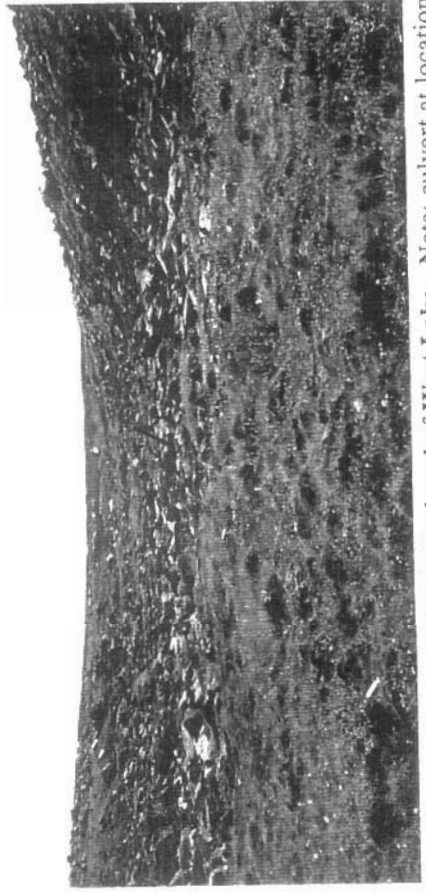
Road crossing at south end of West Lake. Note: culvert at location of tributary stream.
